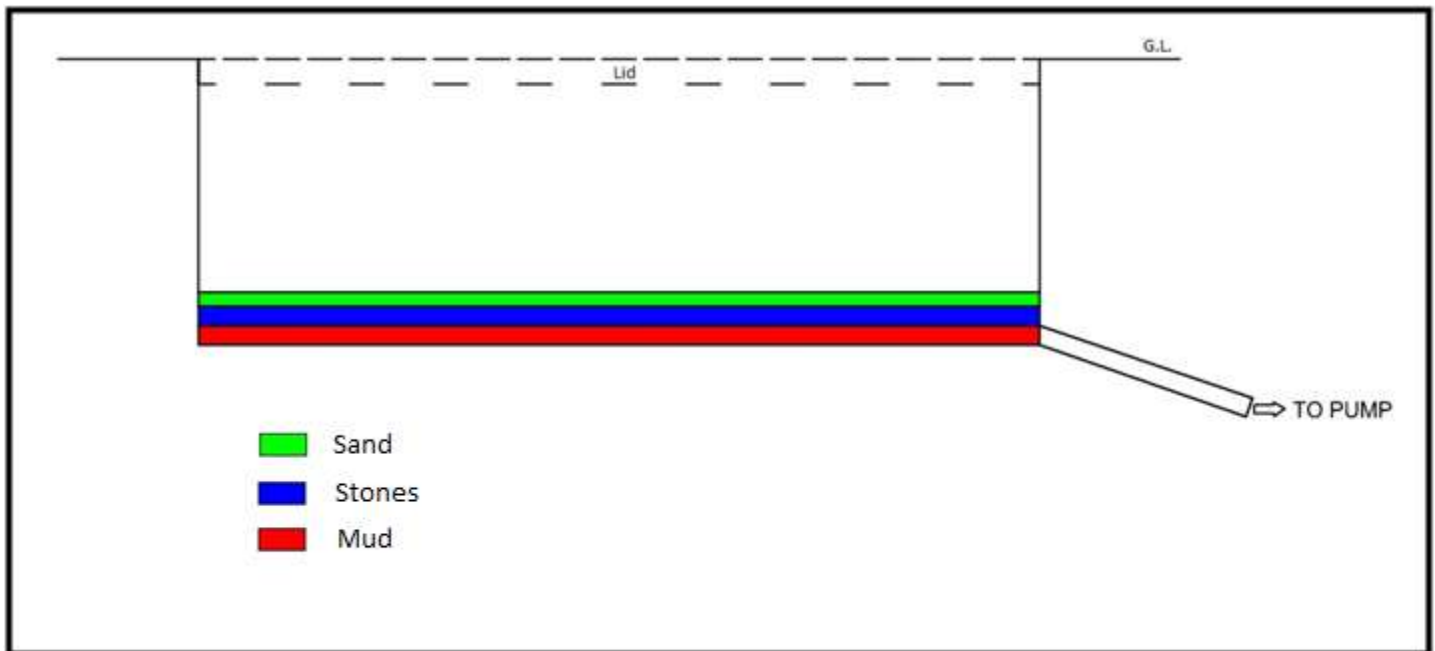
Typical layout of the underground water tank for RH (pumping method)
